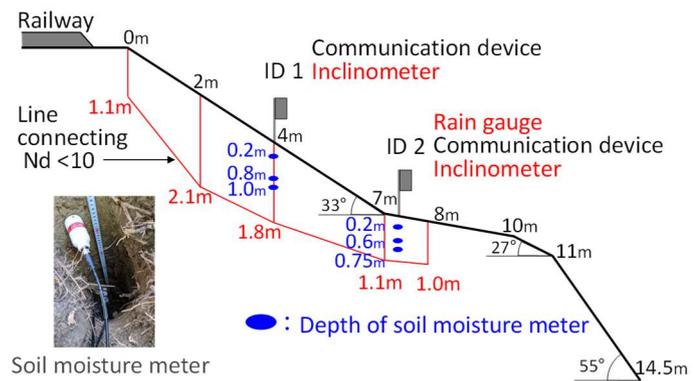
Cross-sectional shape and equipment status (Observation site A)
